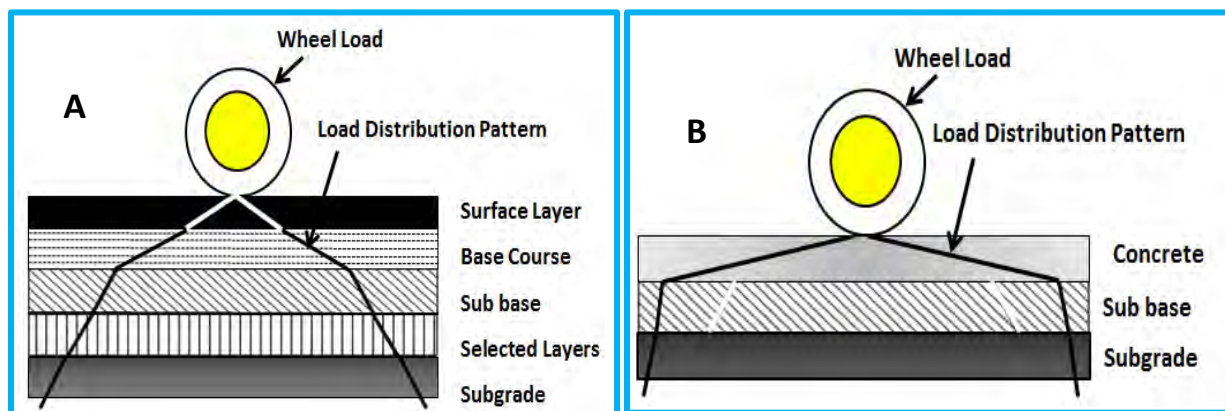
Shows both pavement types and the distribution load patterns on both kinds (A) Flexible pavements (B) Rigid pavements.
